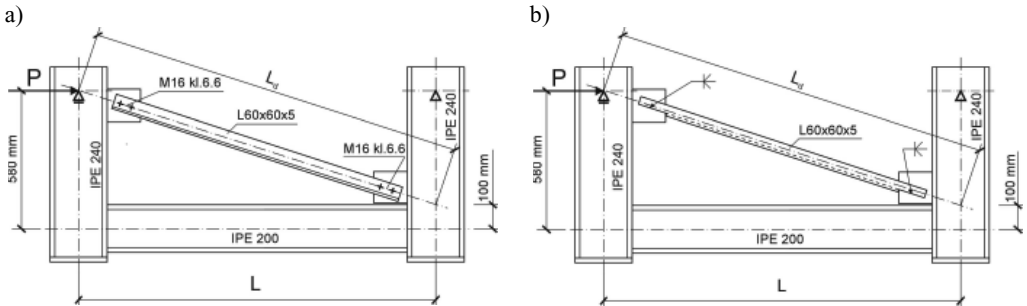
Geometry of tested sub-frame specimens; a) BL specimens, b) WL specimens.
